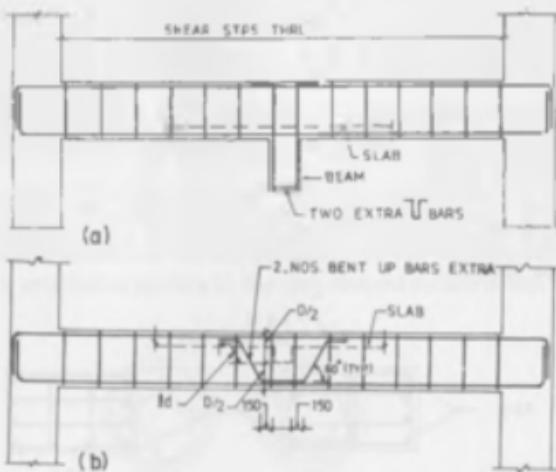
20. (a) Extra long bars to support beam at the lower level; (b) Extra bent-up bars under concentrated load of the supporting beam.
